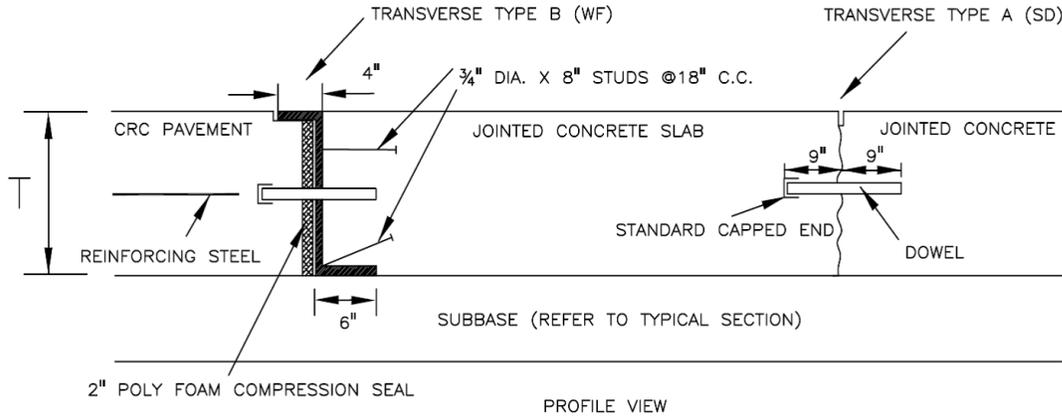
Transition details between CRC and JC pavements using a modified wide flange.
